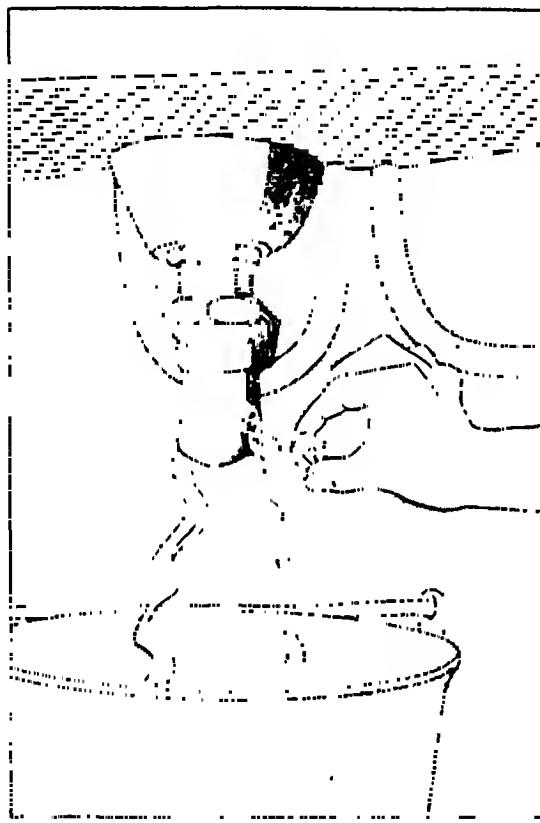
Clearing an S-bend. The picture shows a modern type of bend with clearing caps located in the sides of the 'S'
